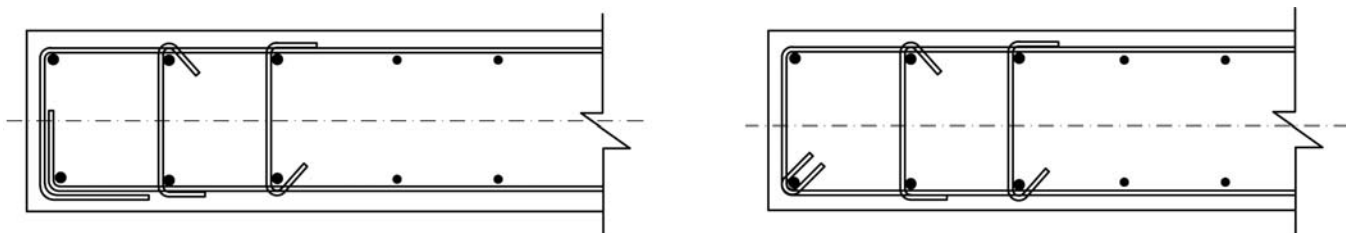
Typical partially confined shear wall boundary zone details used by some Chilean engineers.
